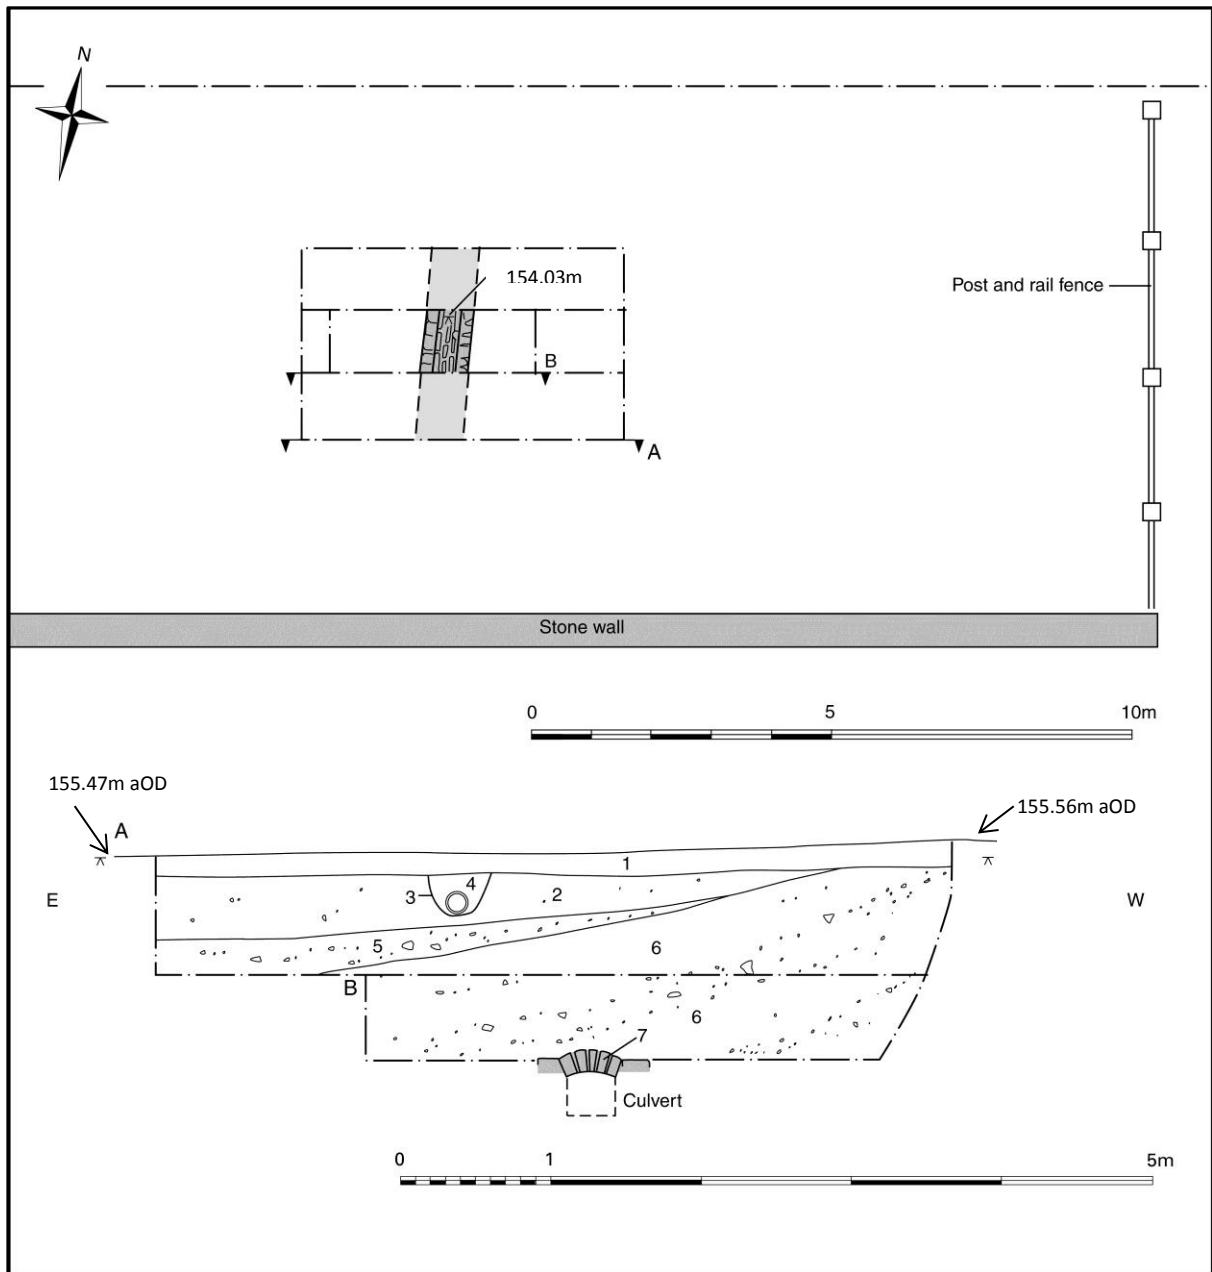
Plan and section of the trial trench. Note that the southern (north-facing) section was slightly more instructive for drawing. (Andy Isham)
